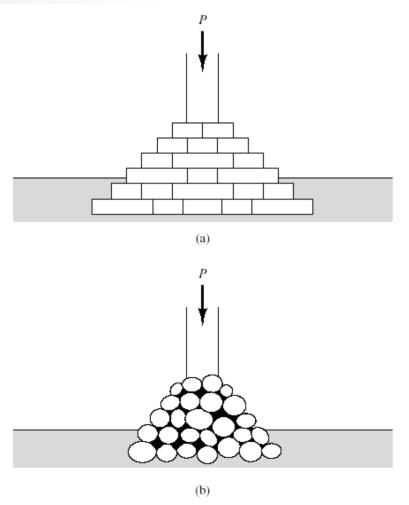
Continuous strip footing (FHWA, 2002c).
